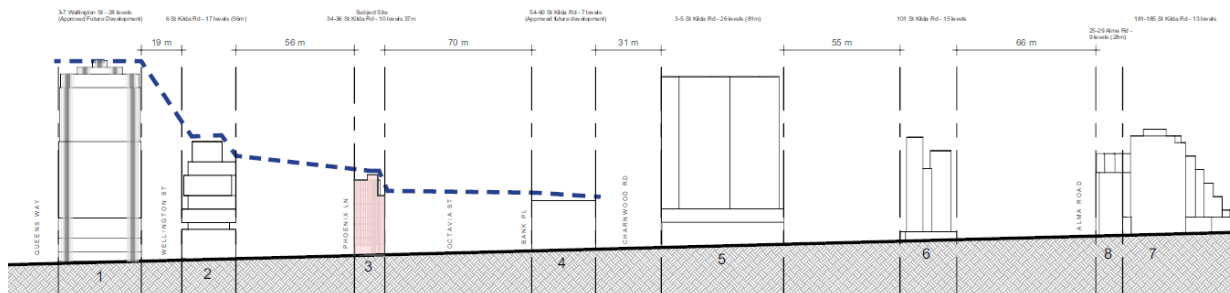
The proposed amended development within the broader streetscape context, with existing an recently approved, yet to be constructed development.
